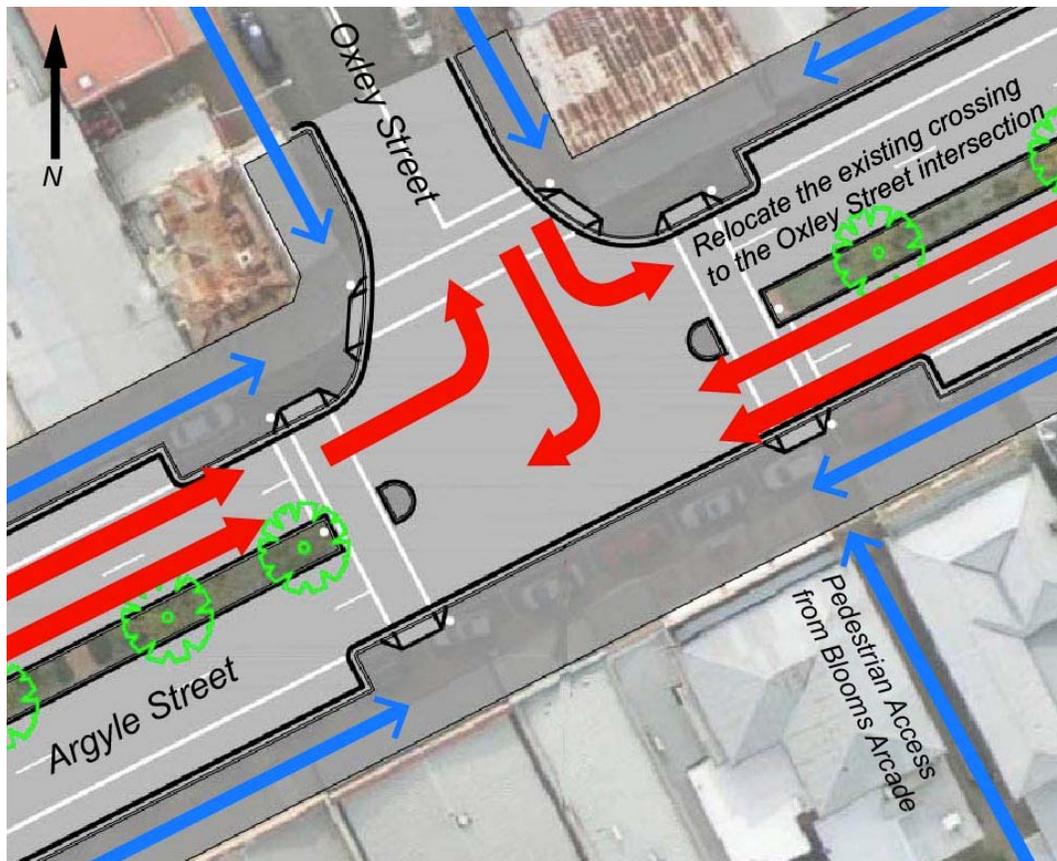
Proposed signalised intersection corner Argyle Street and Oxley Street
